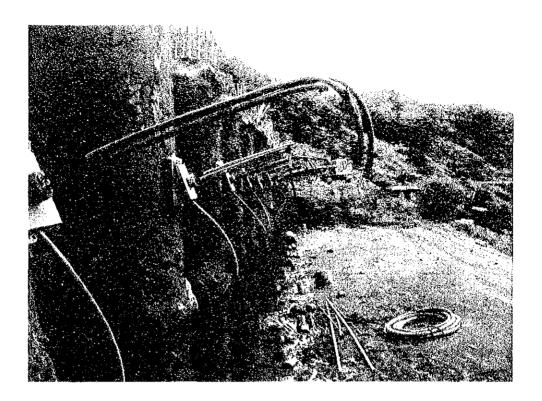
Reinforced Concrete pile with Ground Anchor
